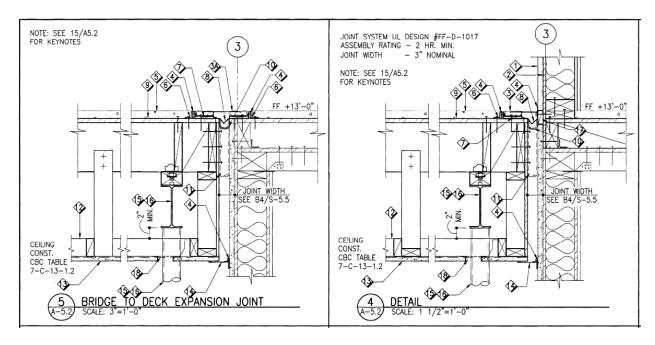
Details 4 and 5 A5.2 of the architectural drawings by JE Jacobs Facilities Inc. dated April 2, 2001.
